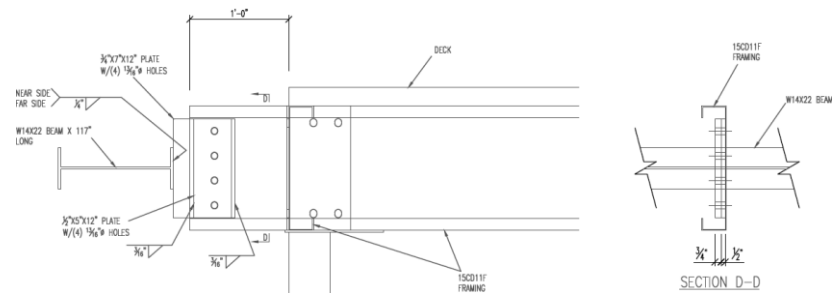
ACTUATOR ATTACHMENT TO MEZZANINE C-CHANNEL SECTIONS
